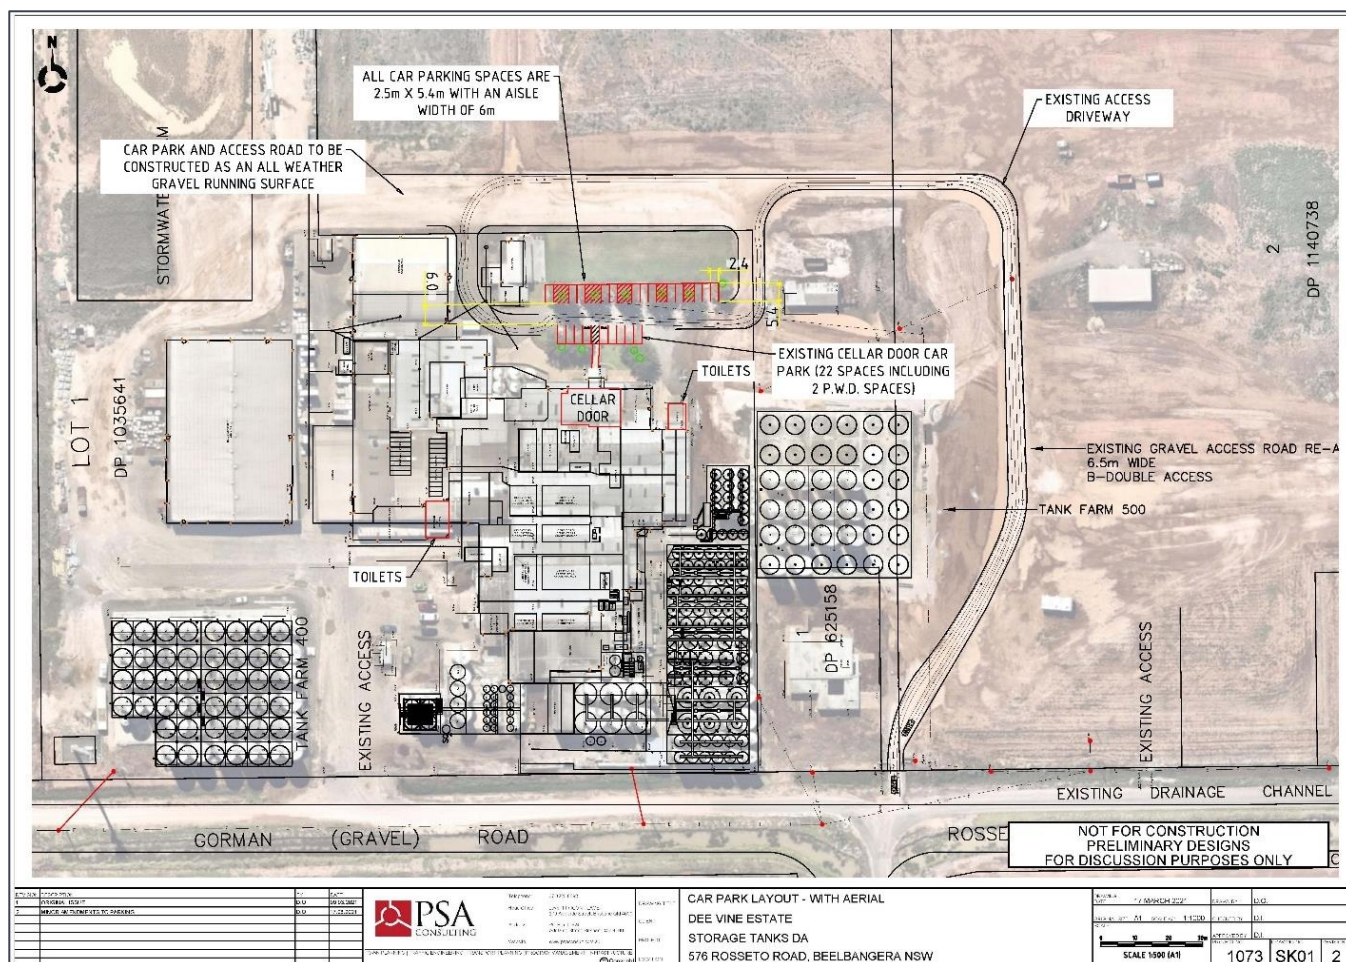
Dee Vine Winery - Cellar Door, Car Parking & Amenities Context Plan
